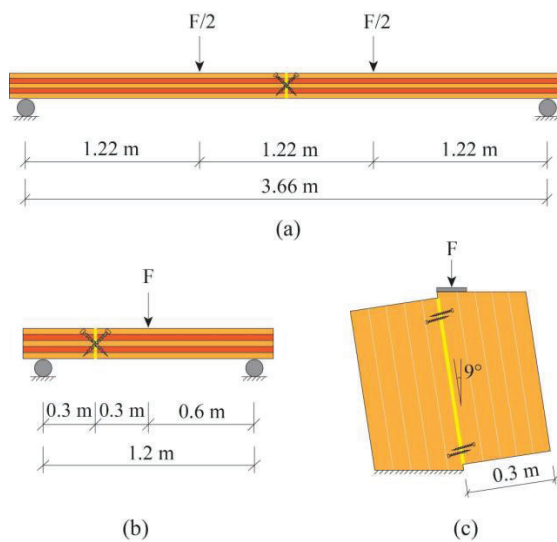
Proposed testing on CLT panel-to-panel connections (a) Out-of-plane bending test (b) Out-of-plane shear test (c) In-plane shear test
